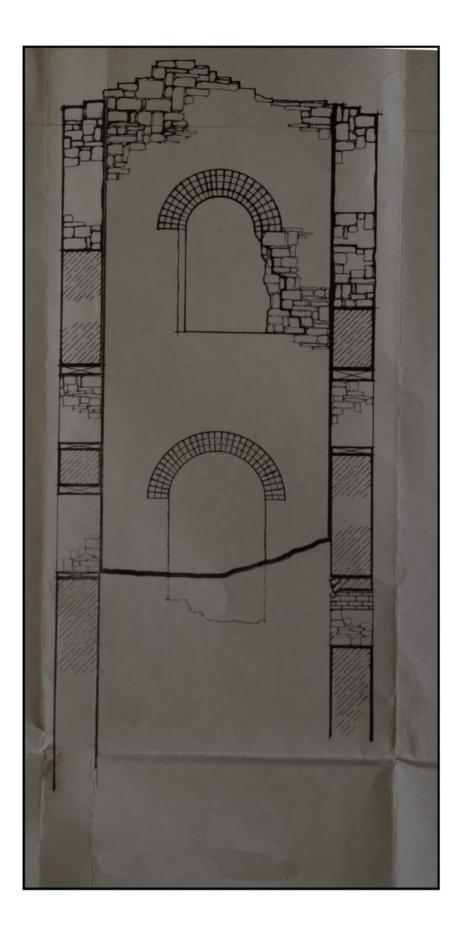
Cornish engine house; west to east cross-section, Snailbeach, after Morriss 1997
